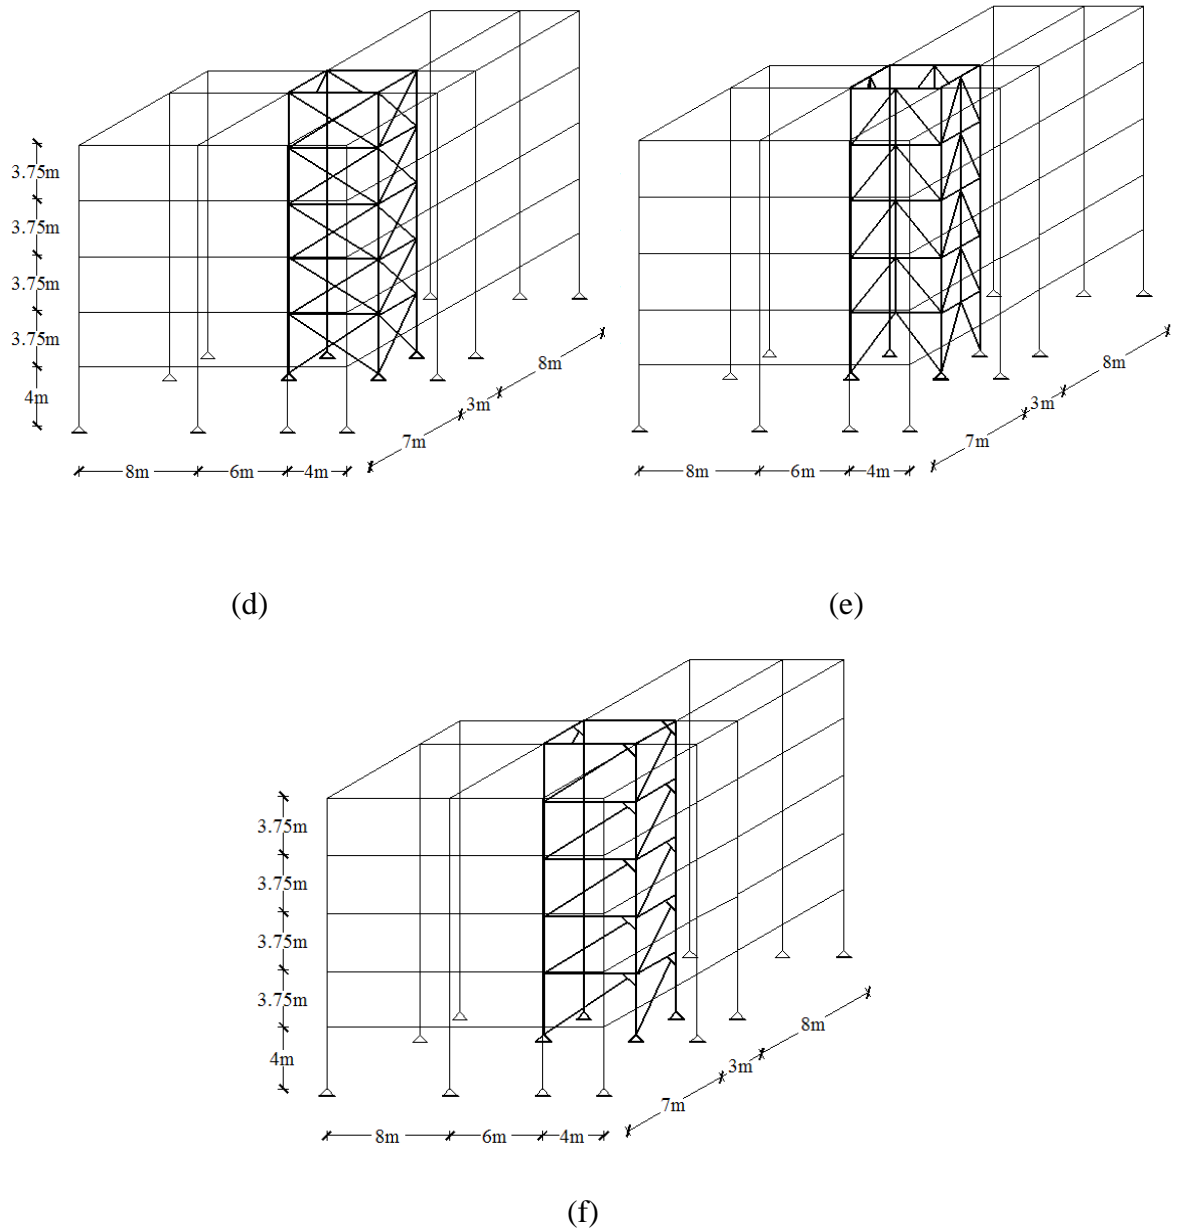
Asymmetrical Plan and Symmetrical Section core (d) cross (e) zipper (f) knee bracings.
